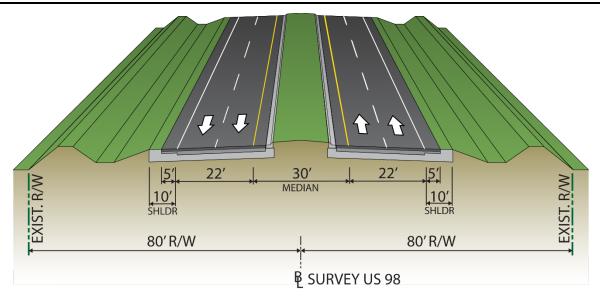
Proposed US 98 C2 (Rural) Typical Section
